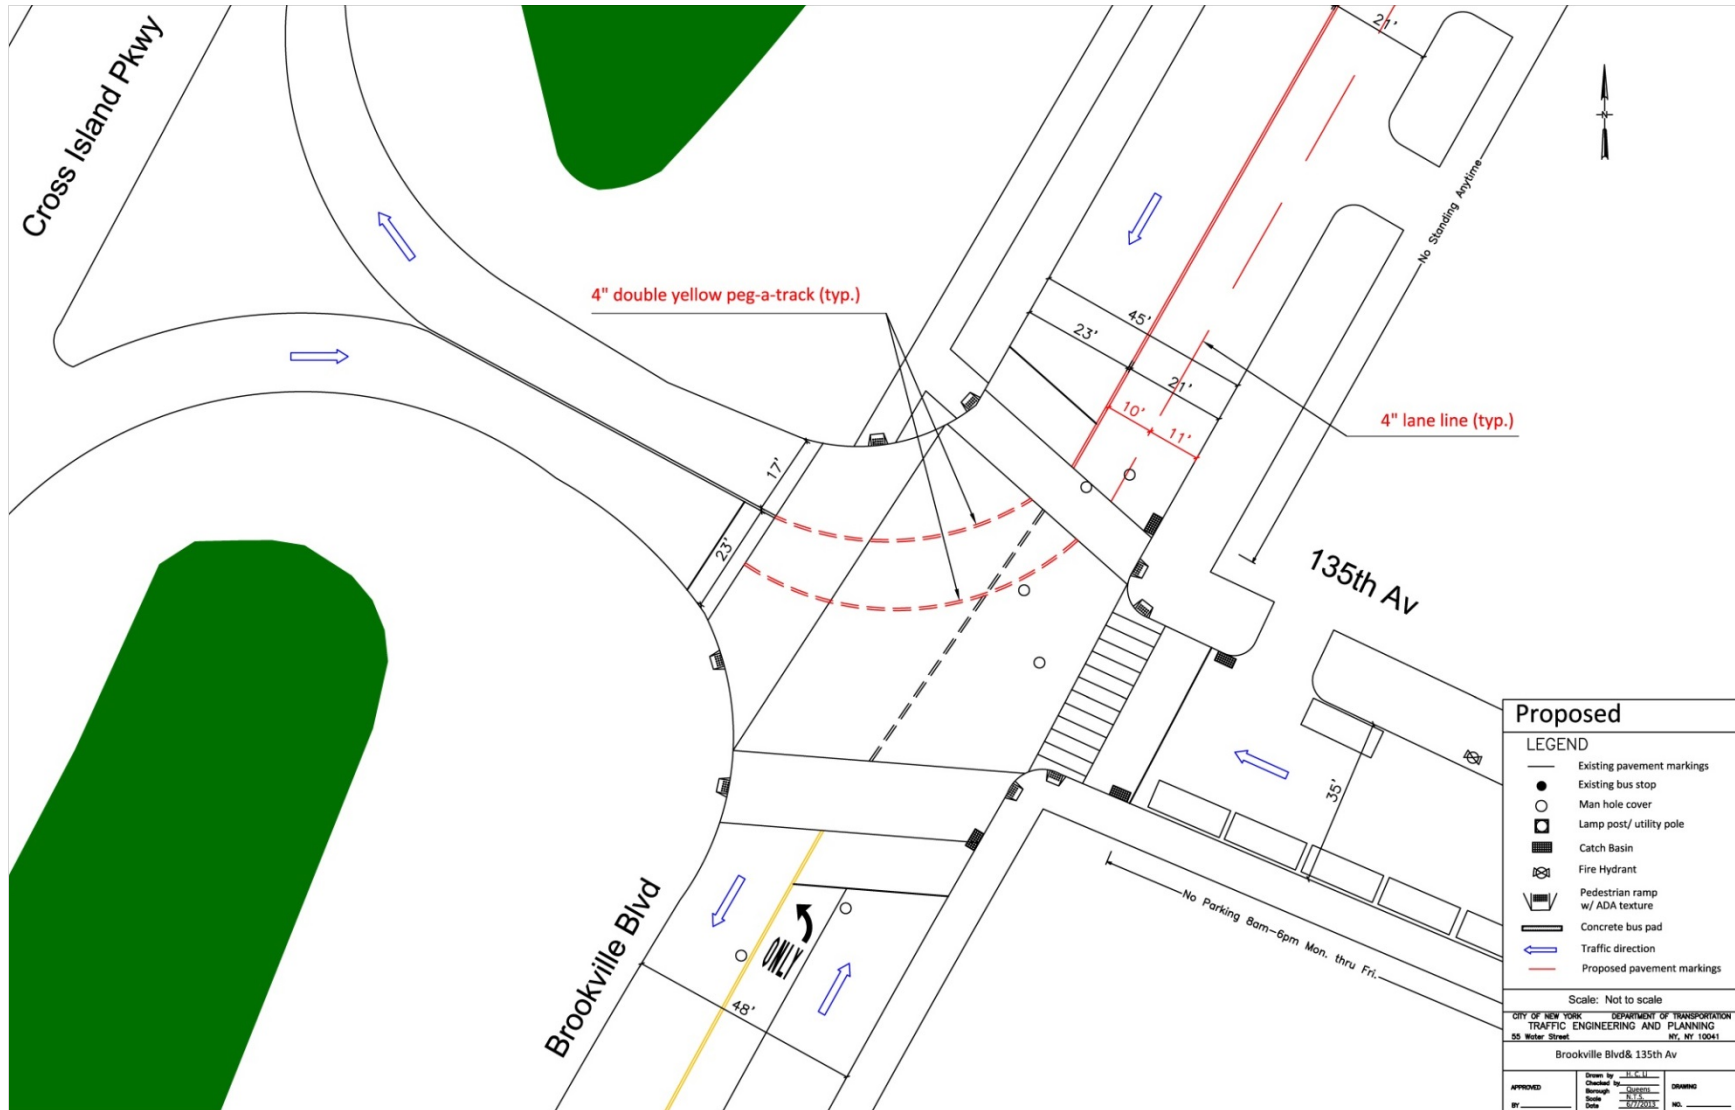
Brookville Boulevard and 135th Avenue - Proposed
